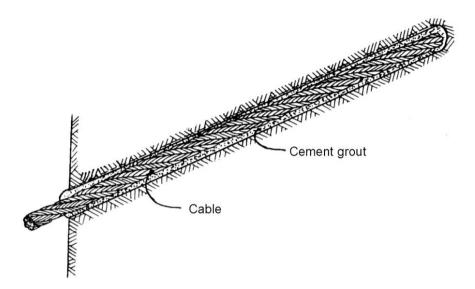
Grouted cables can be used in place of rebar when more flexible support is required or where impact and abrasion can cause problems with rigid support.
